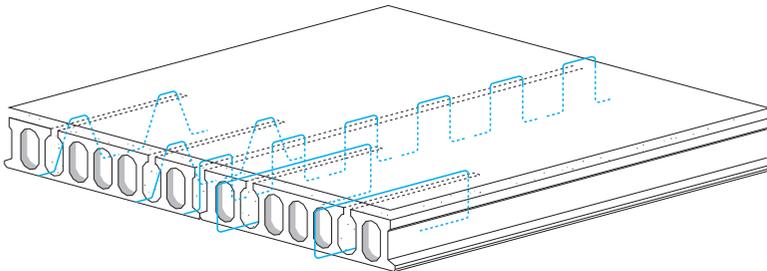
Possible connecting reinforcement between hollow core floor and the corroborent cast in situ topping
